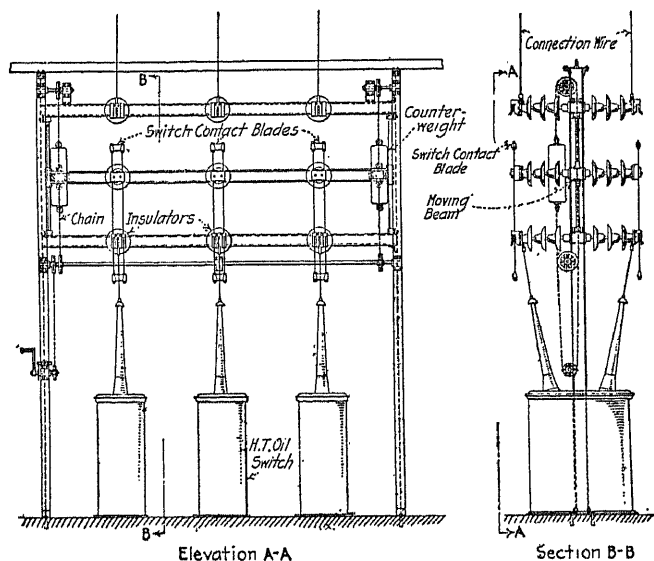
Bayonet-type Disconnecting Switch Requiring Small Aisle Space
